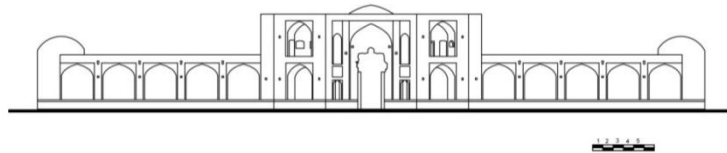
and 7 Elevation and the Entrance doorway (source: Authors)
